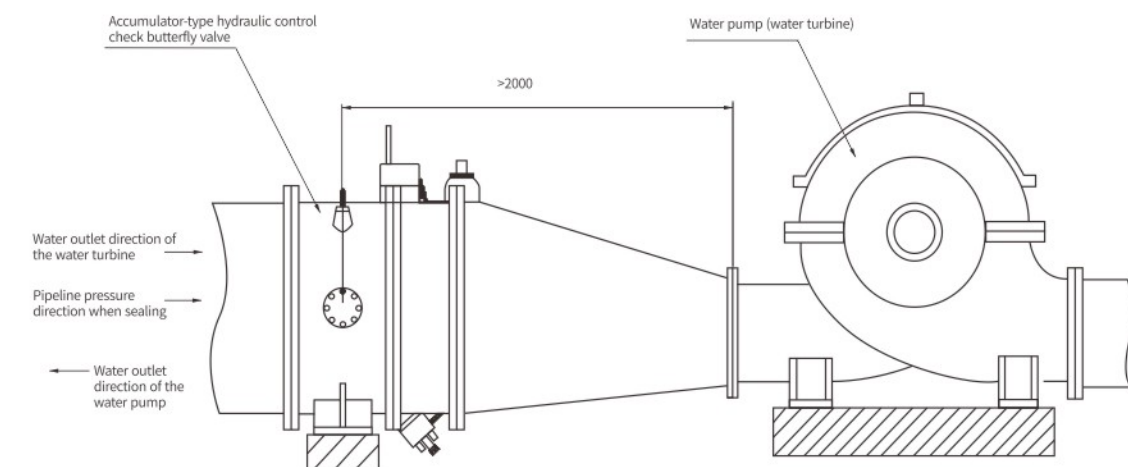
Accumulator type hydraulic control check butterfly valve (reverse installation)
